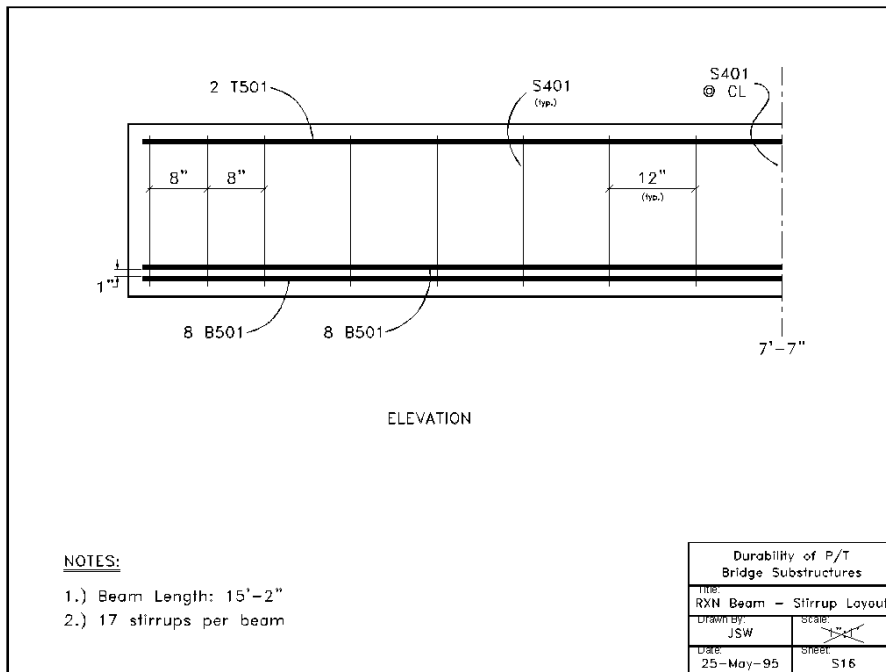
Sheet S16: Reaction Beam Stirrup Layout ^{4.2}
